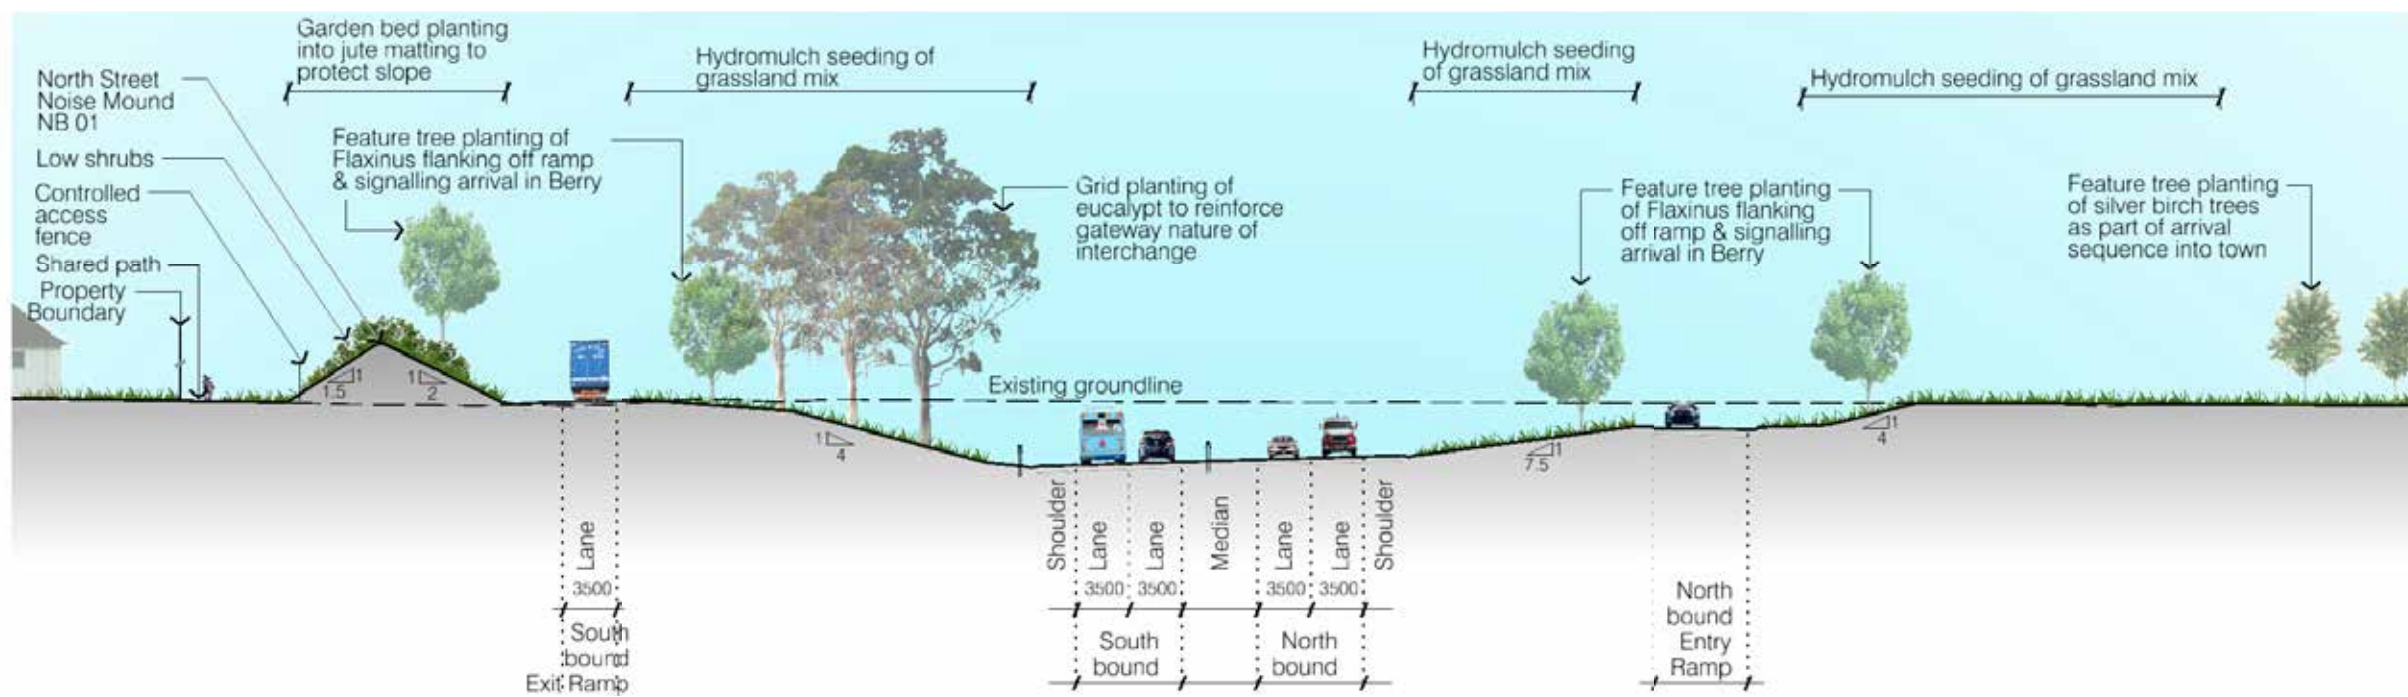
Road cross section at Ch. 17550 (Scale 1:500 @ A3)
